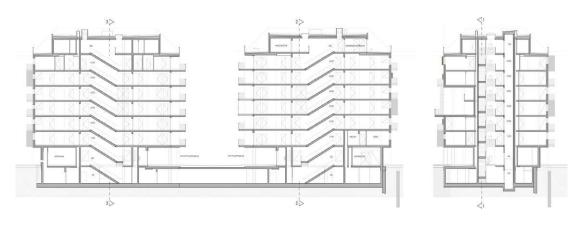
Longitudinal and cross sections (Architecture office 2020)
